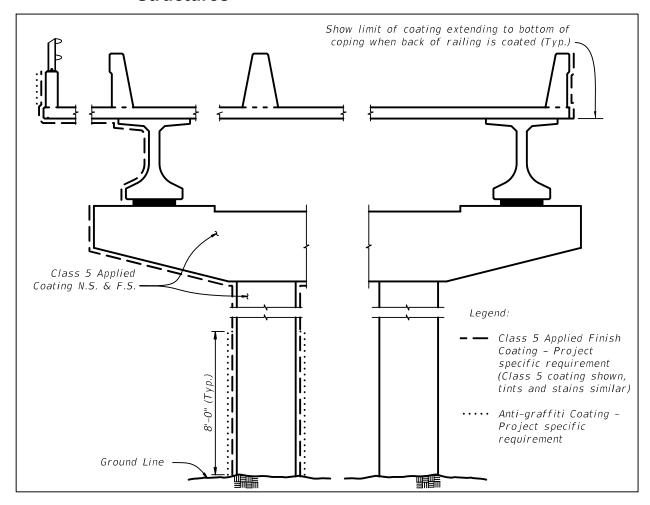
Example Surface Finish Depictions on Waterway Crossings and Railroad Separation Structures
